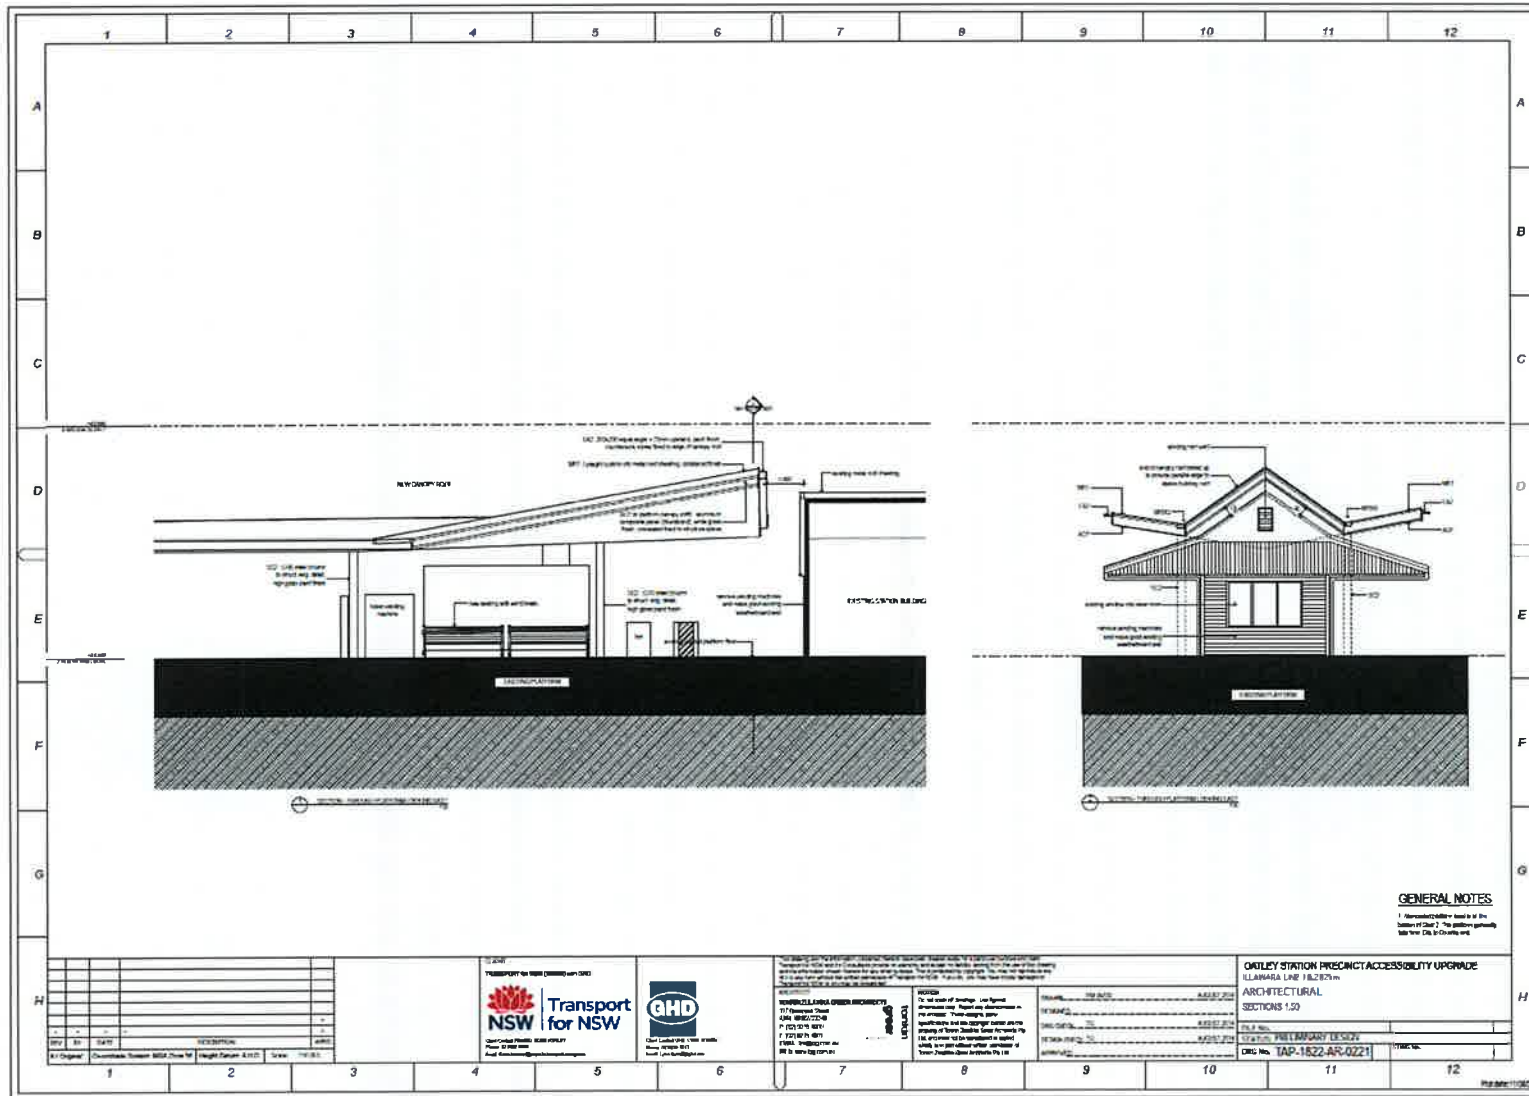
Proposed south and west elevations of Oatley Station showing existing and proposed elements.
